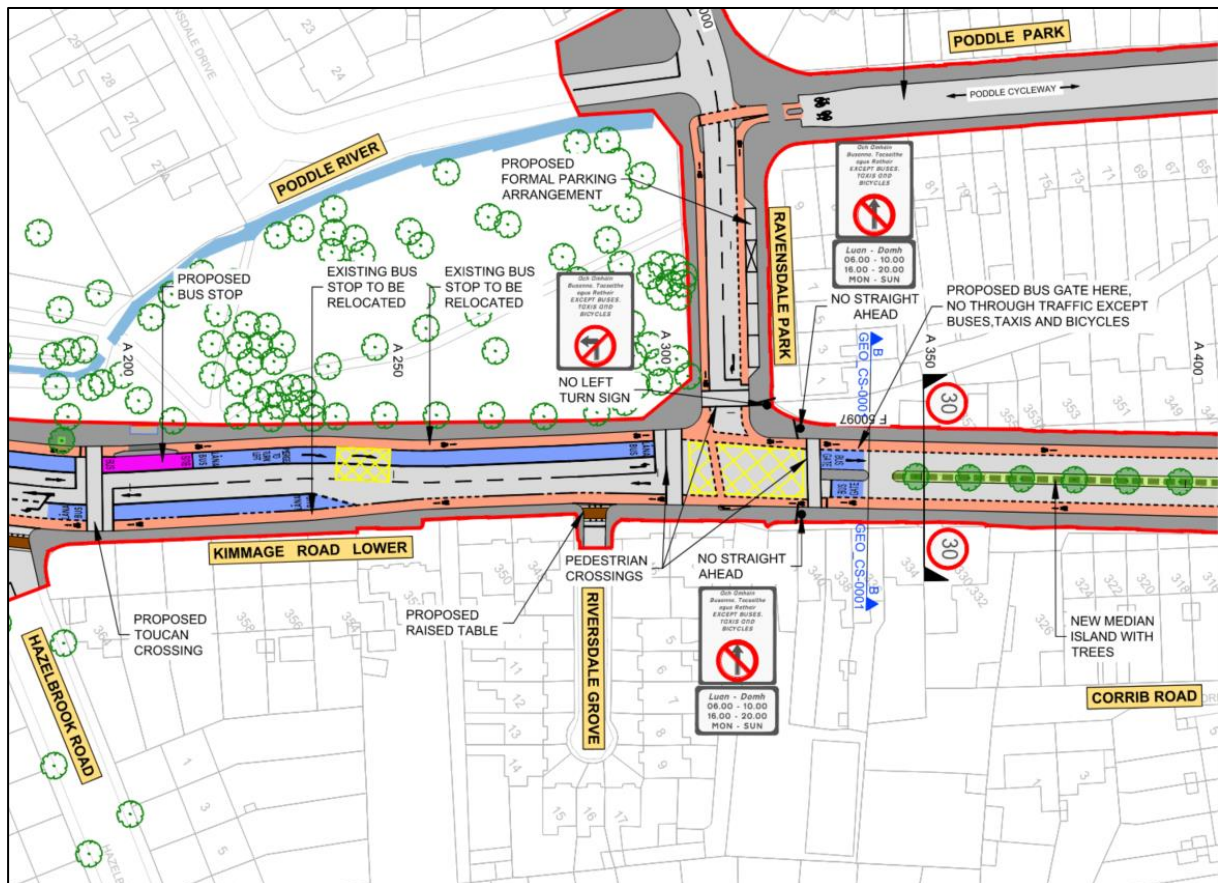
Kimmage-Road Lower between KCR and Ravensdale Park
